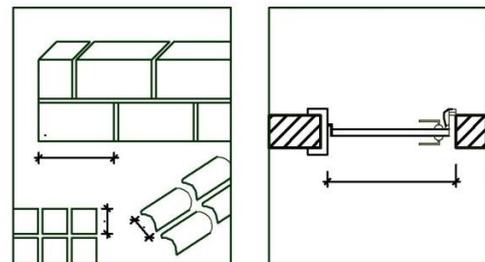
and 16: Modulated Bricks, Floor Tiles, Roofing Tiles and Door Opening
